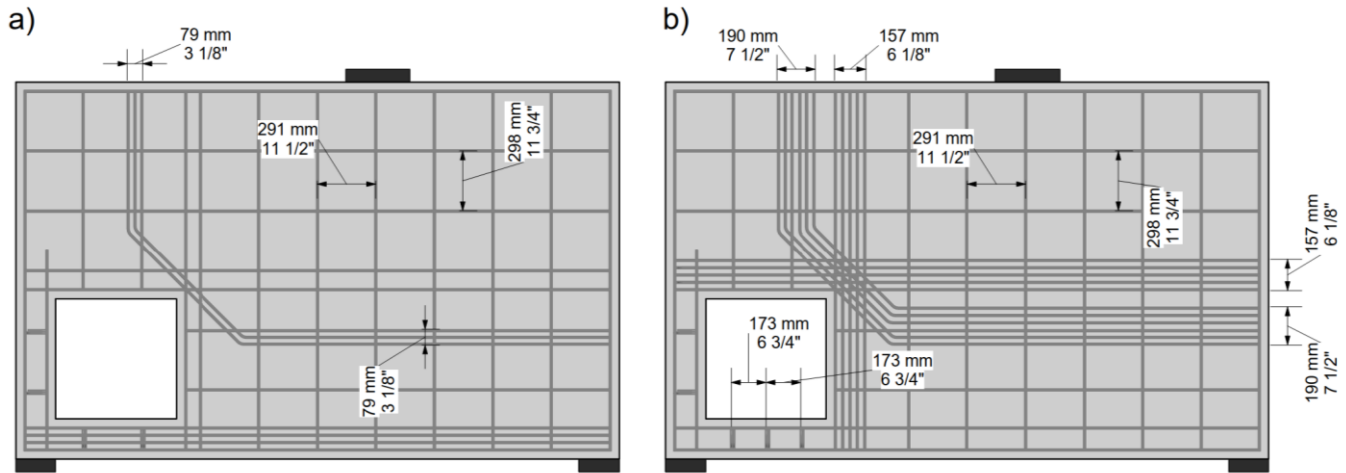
Reinforcement layout detailing of a) SIIIa b) SIIIb.
